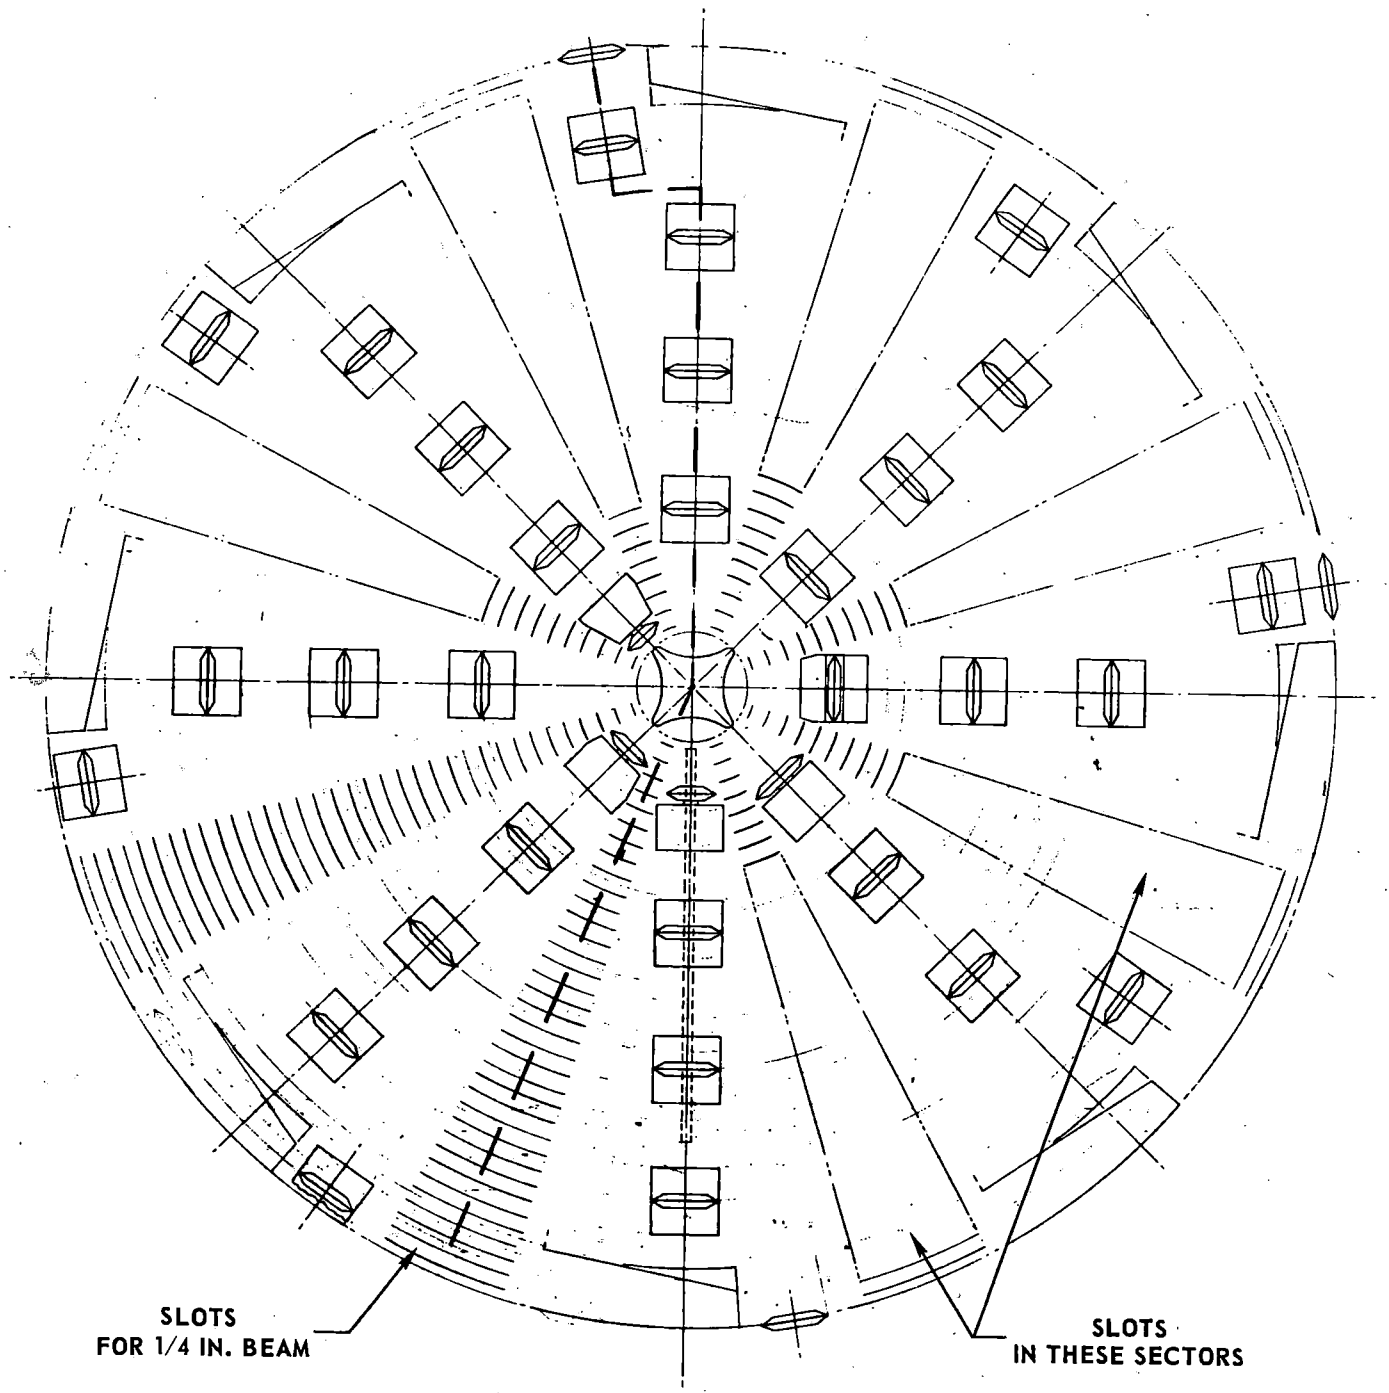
FACE VIEW OF TYPICAL BORING MACHINE HEAD WITH SLOTS FOR LASER BEAMS
